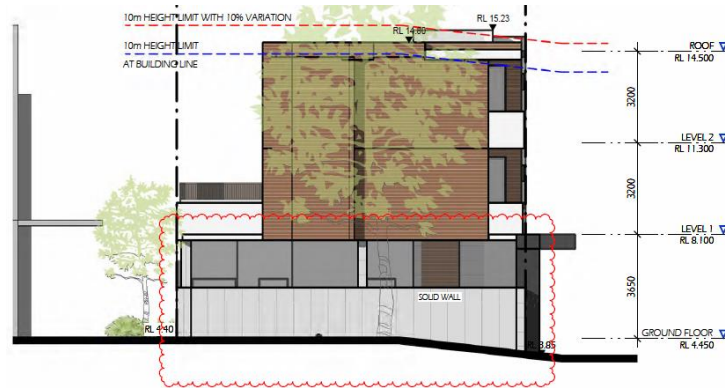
South-Eastern Side Elevation facing adjoining property at 1559-1563 Botany Road
